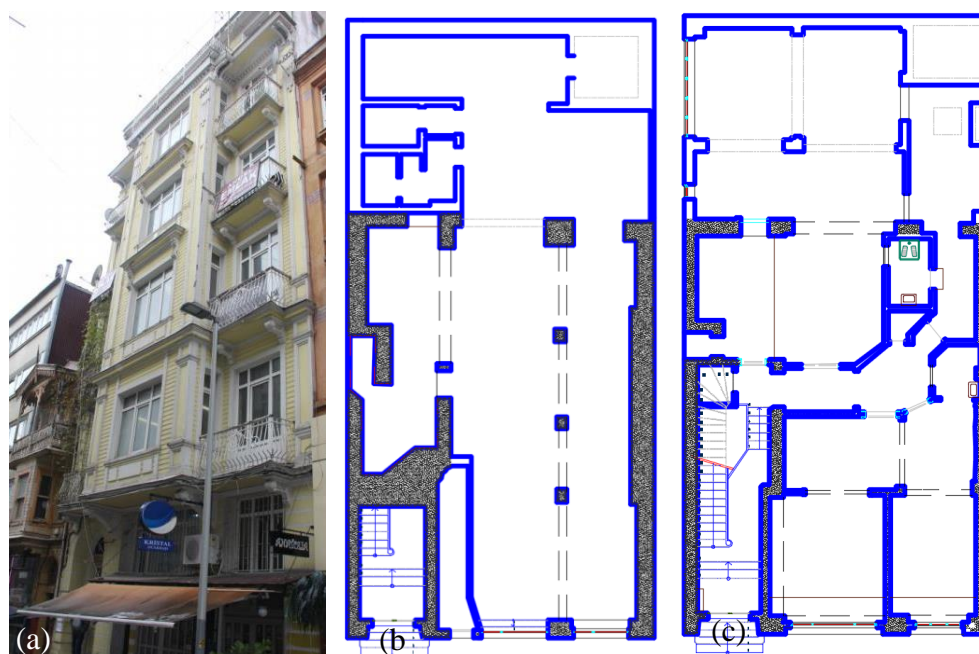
The building: (a) Overview, (b) Basement plan, (c) Ground plan
